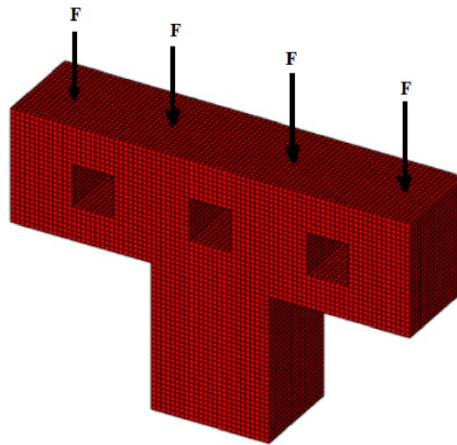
Bridge pier with three holes as structural discontinuities in horizontal braces
